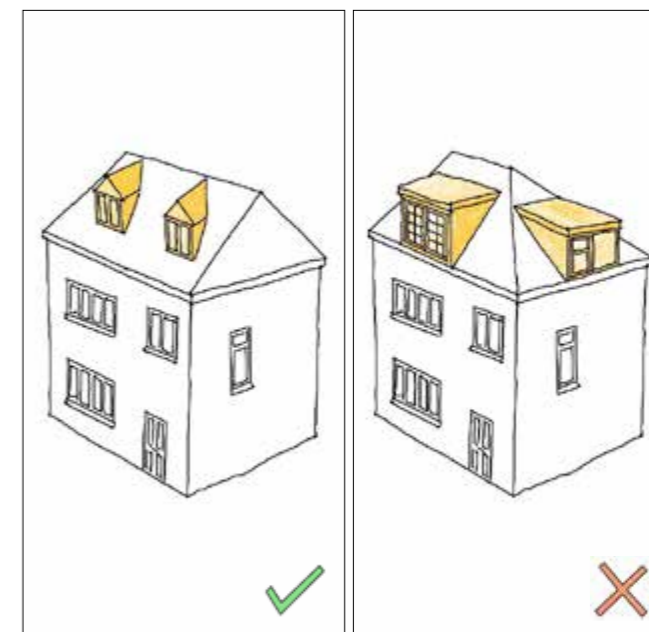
Getting the architectural detail right will be critical for features such as dormer windows
